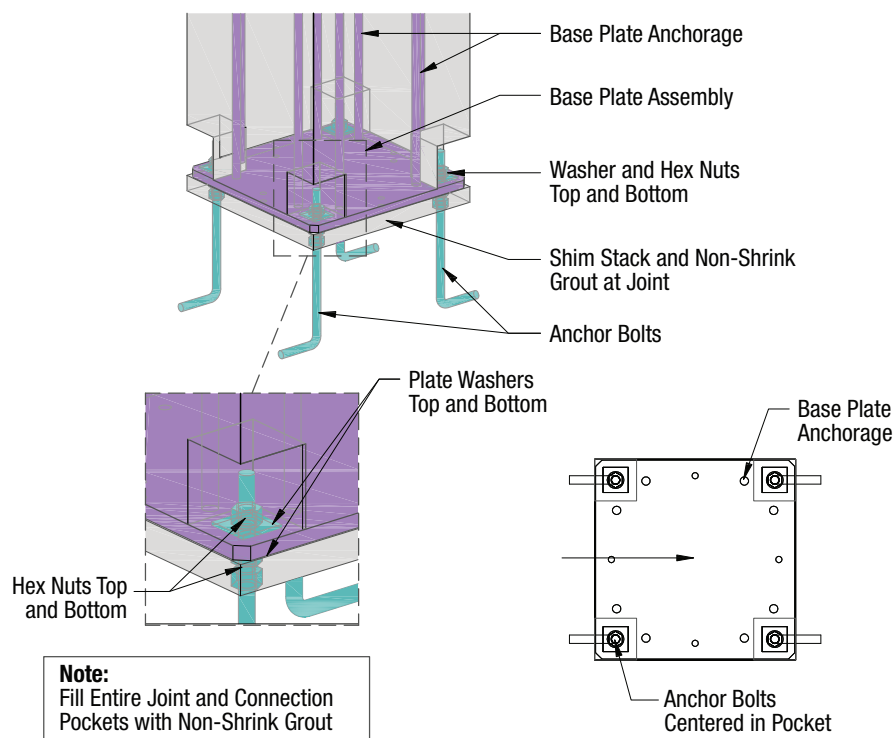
Column to Foundation with corner anchor bolts and continuous column base plate
